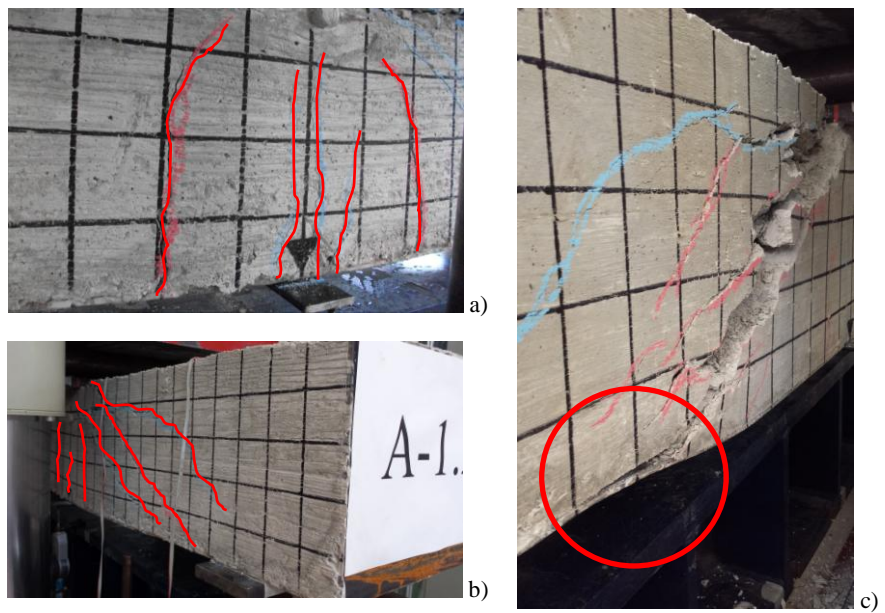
Specimen A1-2: a) vertical flexural cracks; b) first diagonal shear cracks; c) separation of the plate from the block of concrete.
